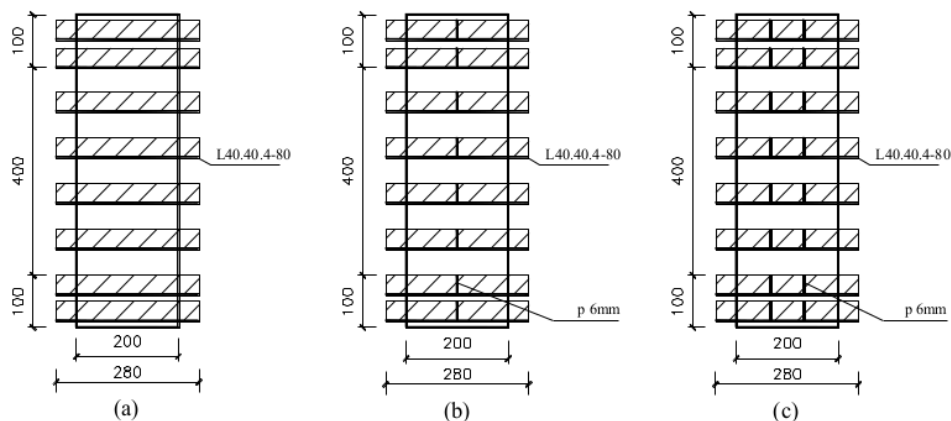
Elevation views of external confinement arrangements of specimens: (a) S04, S04a, S04b; (b) S04c; (c) S04d
